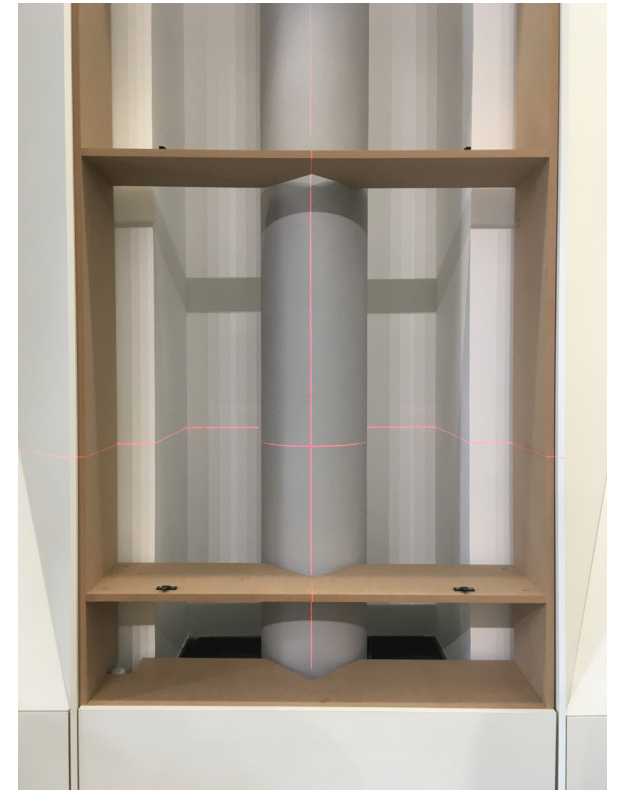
On site photograph, kit-of-parts fitted around existing structure of NBS gallery space
